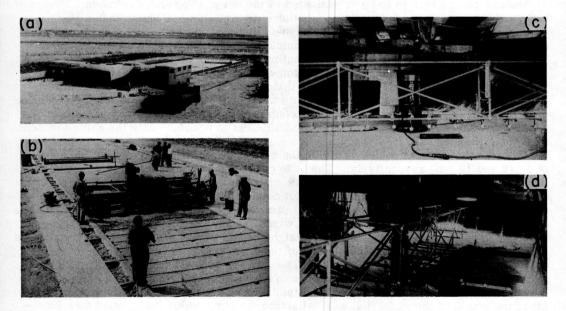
Slabs at Orly: (a) general set-up of test slab; (b) pouring slab-transverse strands placed; (c) testing set-up-repeated loading operations; (d) deflection measurement.
